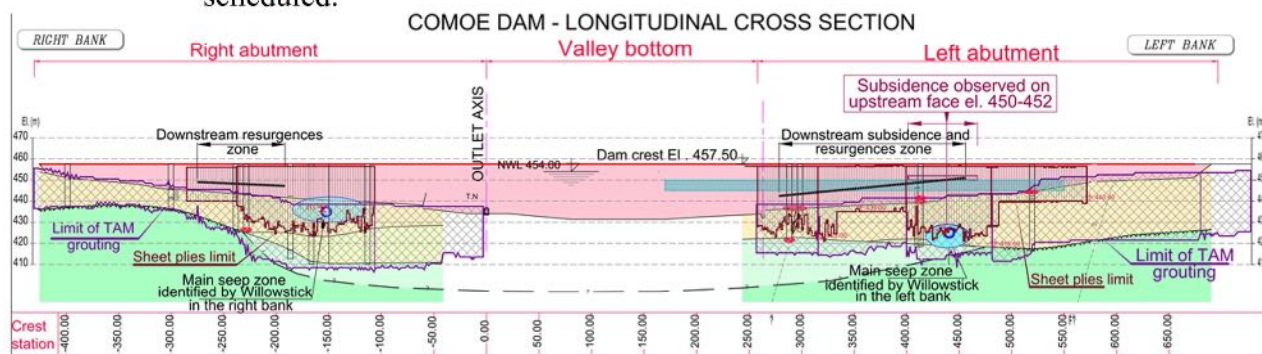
Longitudinal section along the dam axis, presenting the as build SP and TAM grouting on both abutments
